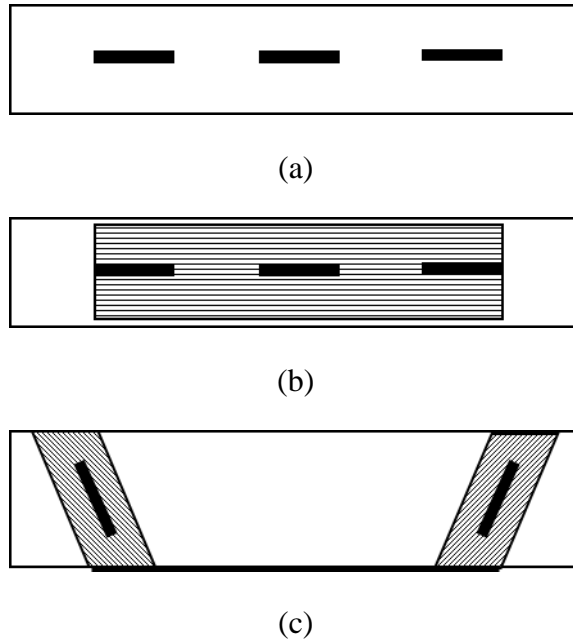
Positions of strain gages (a) Bottom face of un-strengthened beam (b) Bottom face of beams without end anchorage (c) Side view of end anchored beams
